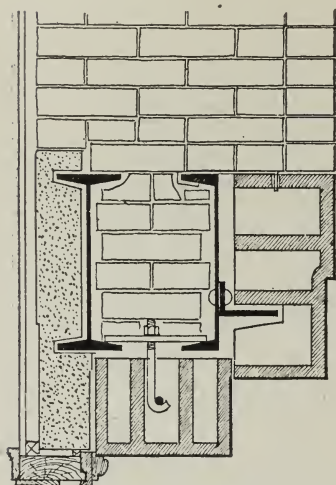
Steel Supports for Masonry. I-beam, Channel, Three Angles and Hook-bolt.
